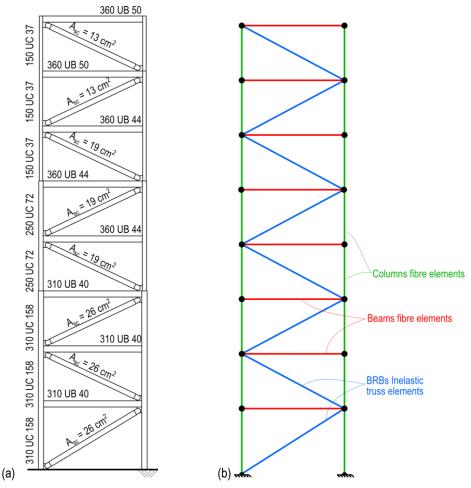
Building F. Sketches of (a) the structural solution and (b) the nonlinear model.
